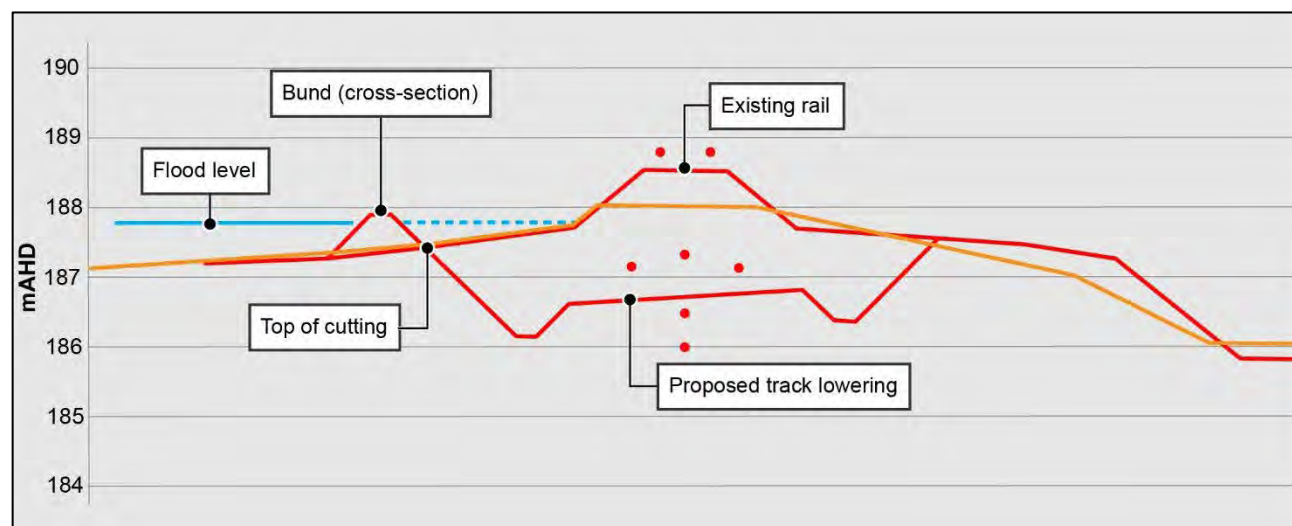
Proposed bund at Pearson Street bridge to prevent rail overtopping
